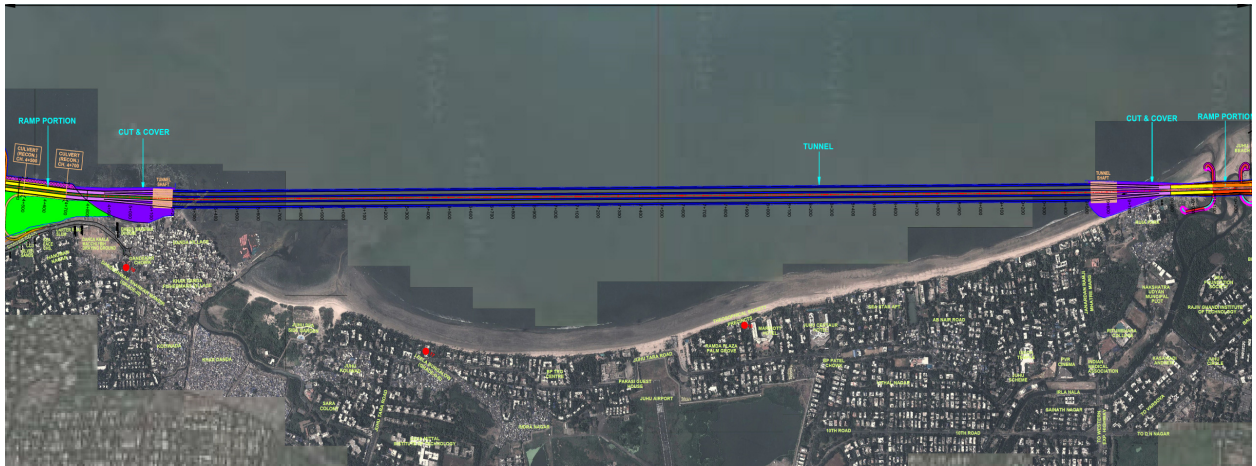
Section 6 Start of Tunnel to Bharat Nagar
